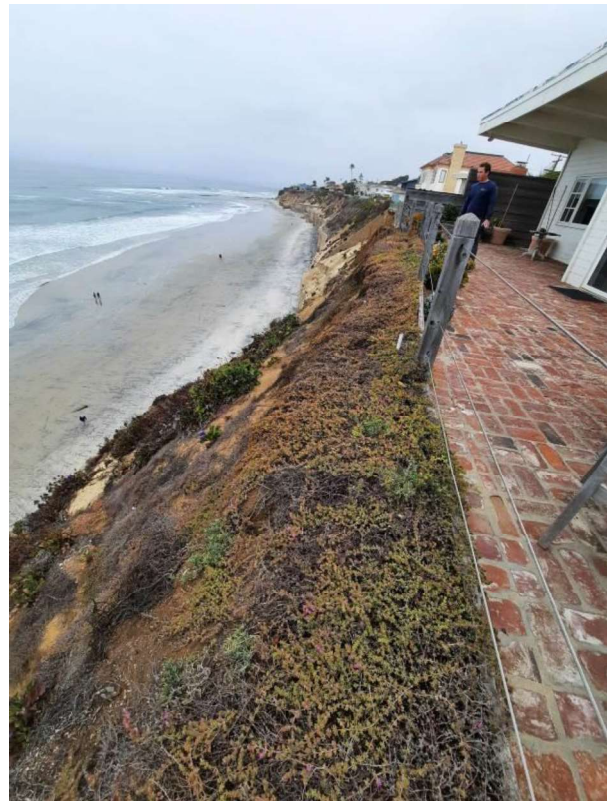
309 Pacific Avenue looking north (May 19, 2022).
